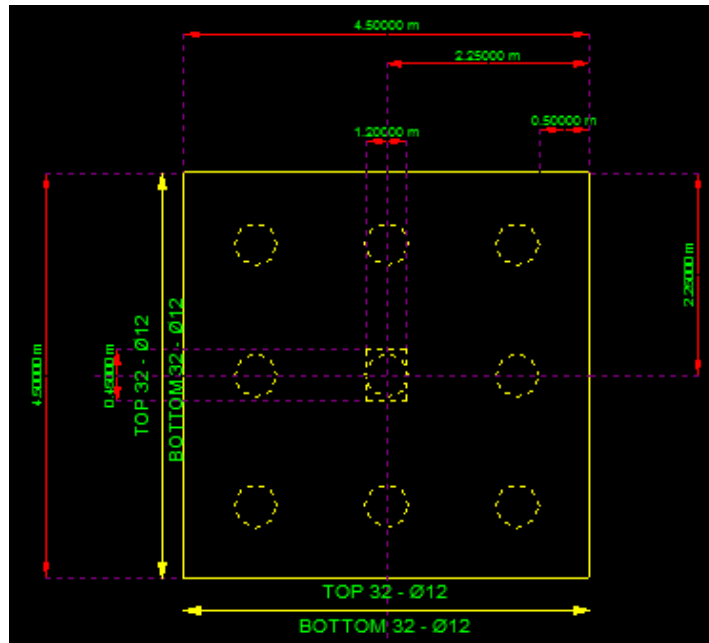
Plan of pile group in STAAD.FOUNDATION
